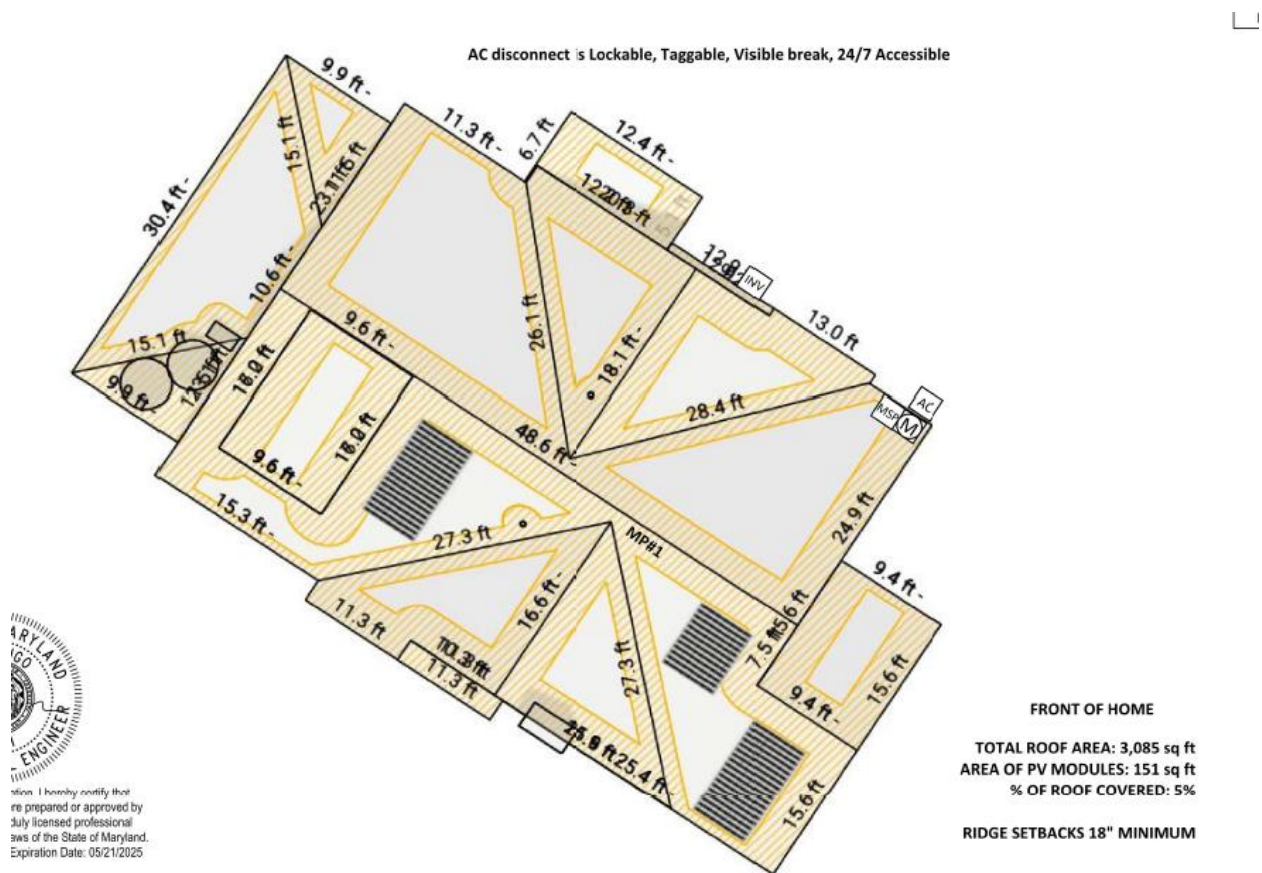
Proposed roof plan showing the locations of the proposed solar shingles.
